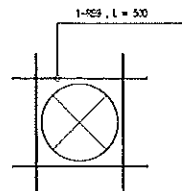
BURSTING REINFORCEMENT AT EXTRA ANCHORAGE
